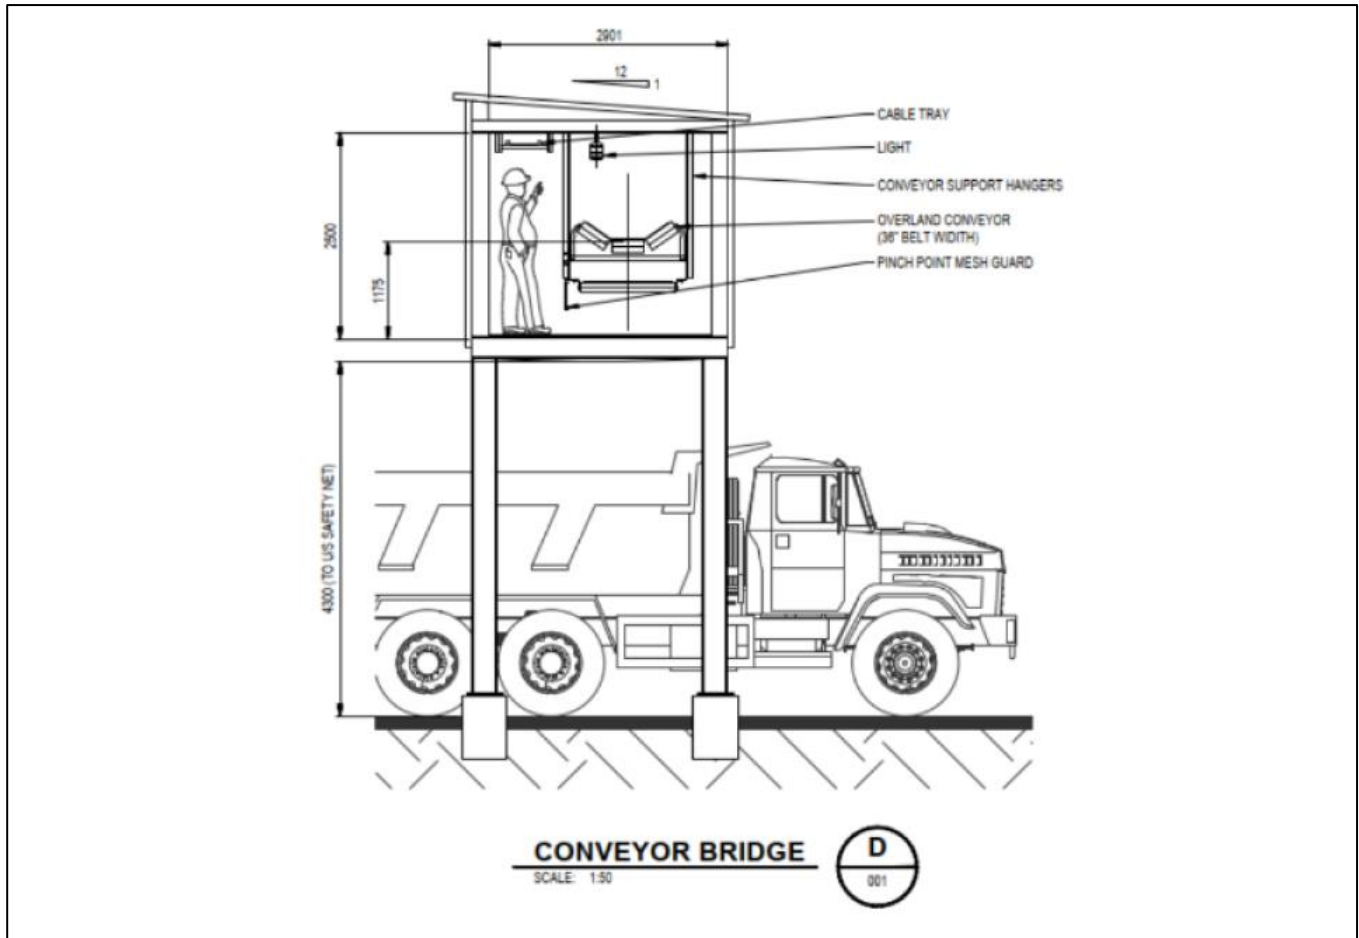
Enclosed Overland Conveyor Bridge Cross-sections
